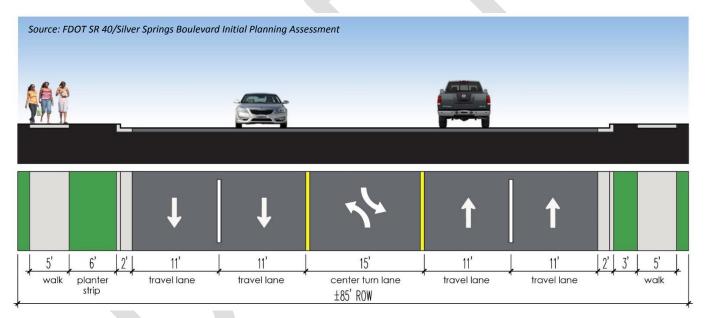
Existing Typical Cross-Section on SR 40 West of SR 35
